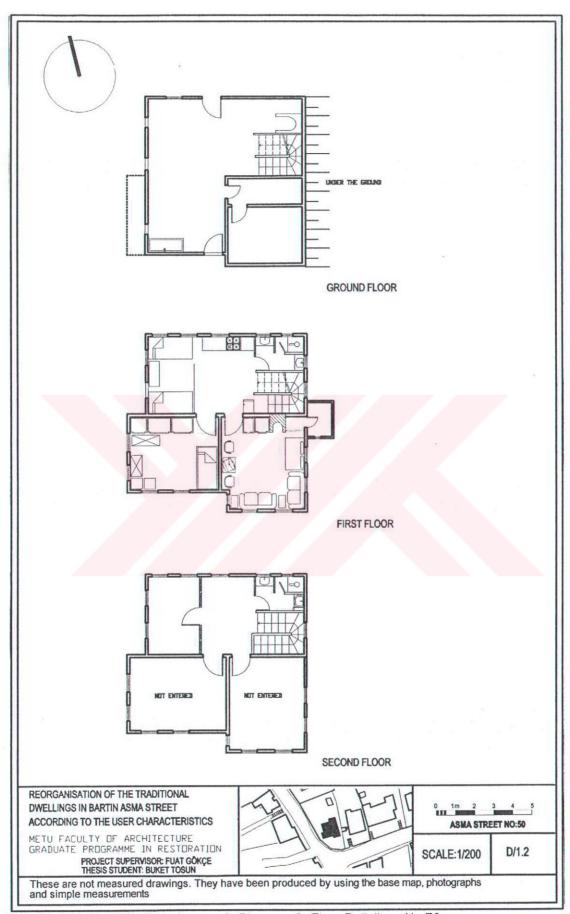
Sketch Drawings of Plans of The Building No:50
